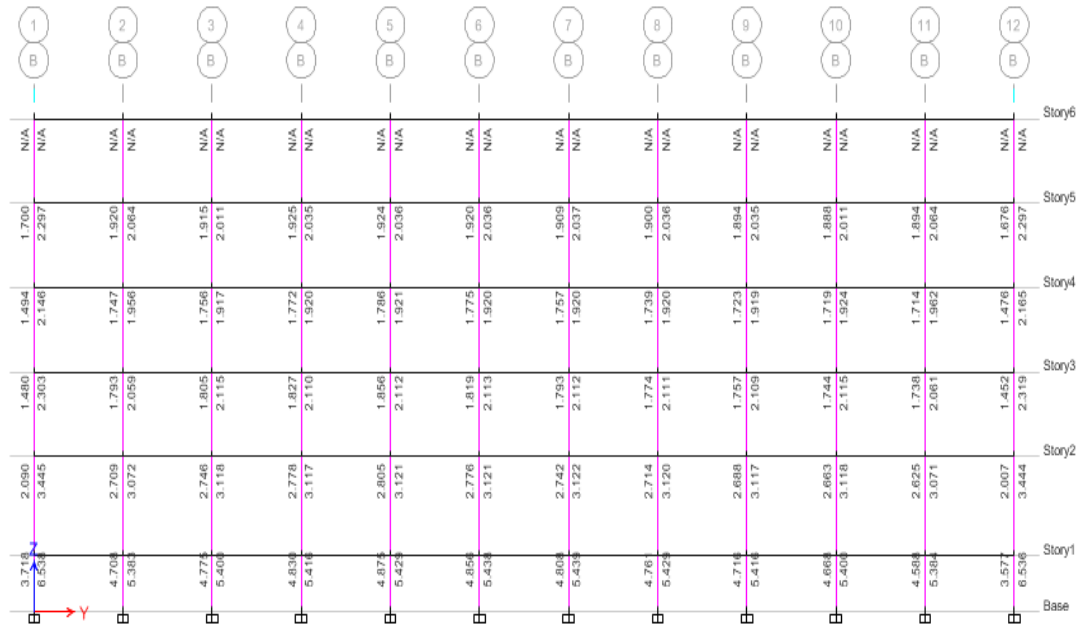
2: Sample column / beam capacity ratios for six story building model along axis B
